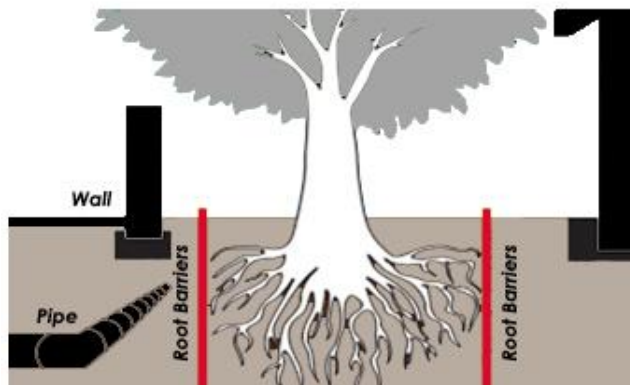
Root barriers for gray infrastructure and building foundation (developed by Author C. Korkmaz from Anonymous, 2023)
